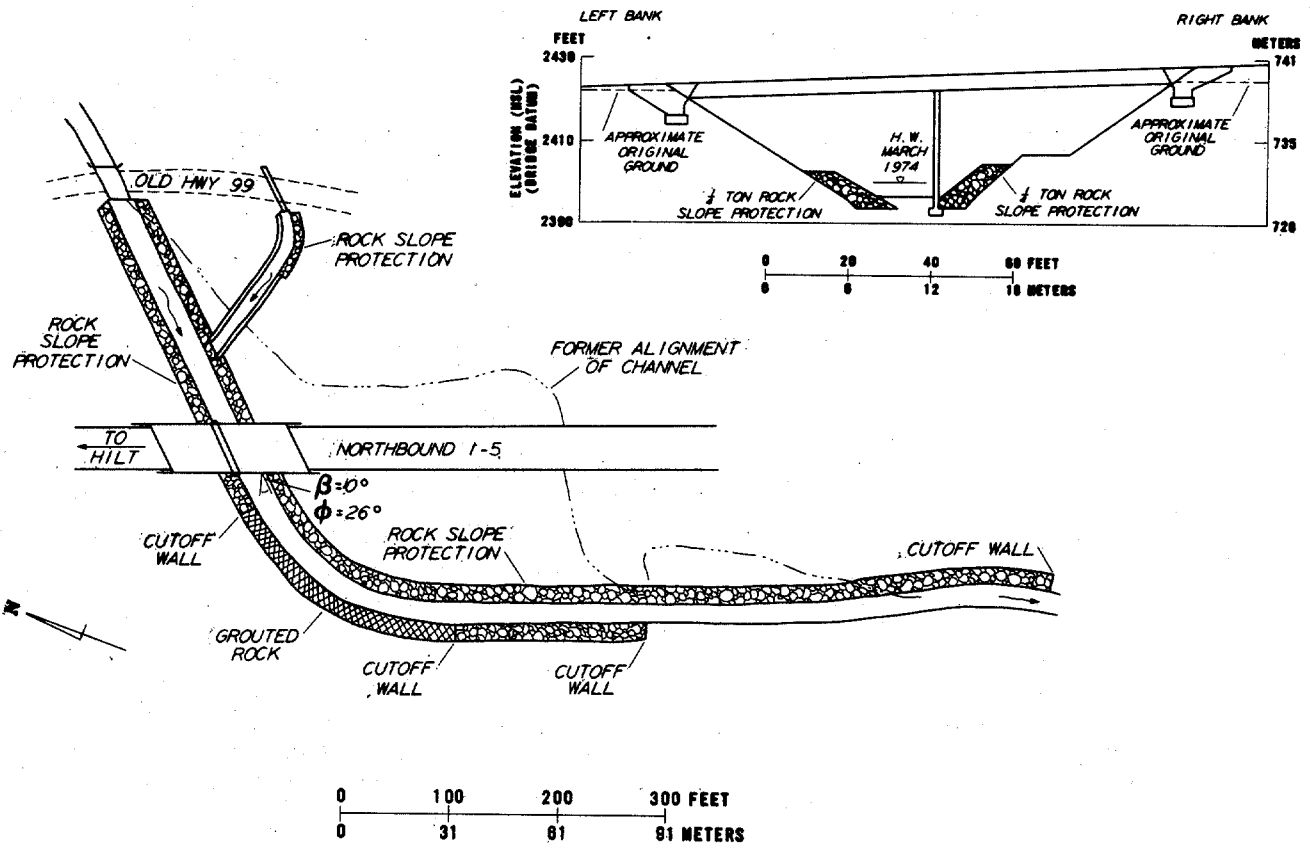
Plan of Hutton Creek at I-5, and (right) cross section of channel at downstream side of bridge.
